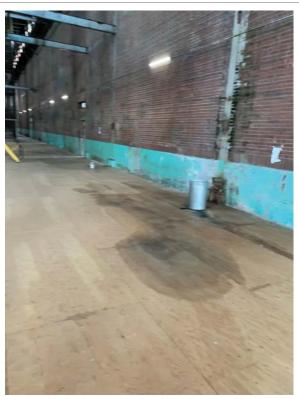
Main Floor – Signs of water infiltration. Water can damage structure and lead to loss of lifespan.
